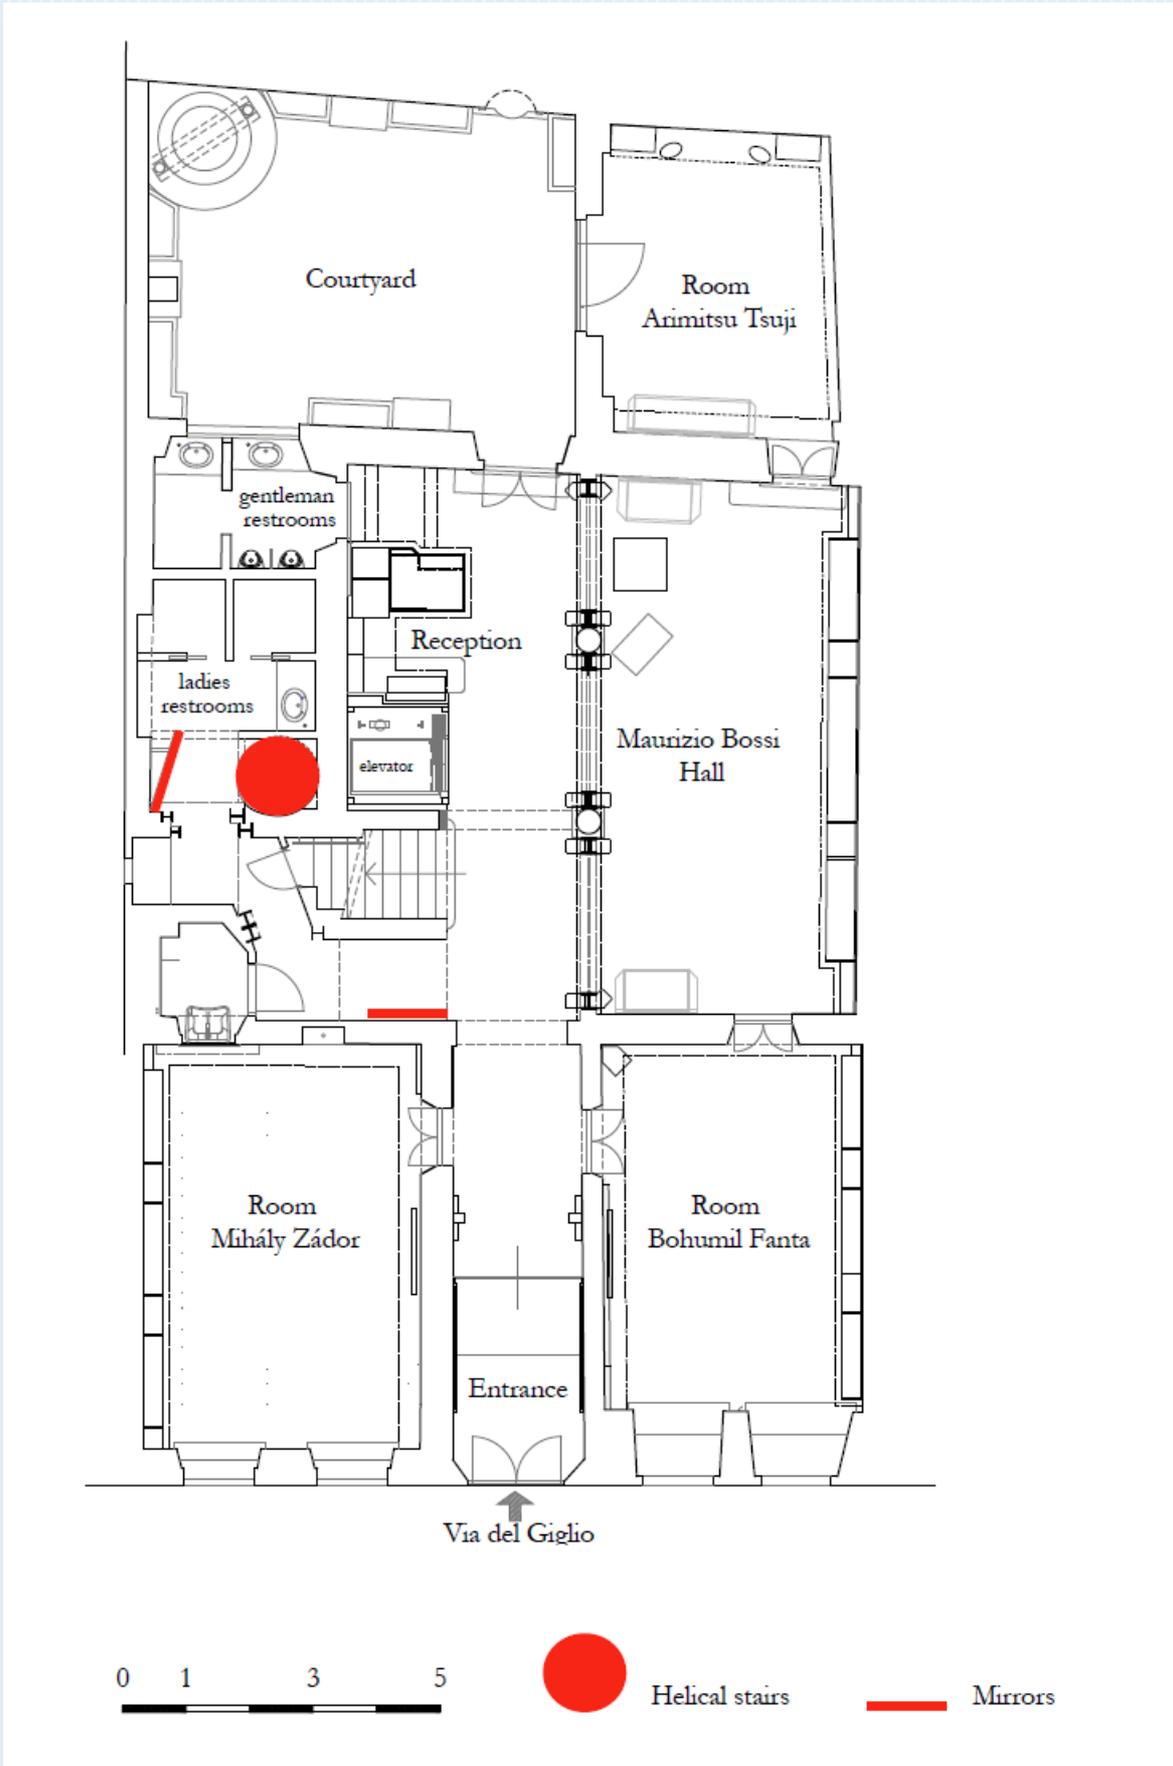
Schematic plan of the ground floor of the mirrors and staircase disposition in red.
